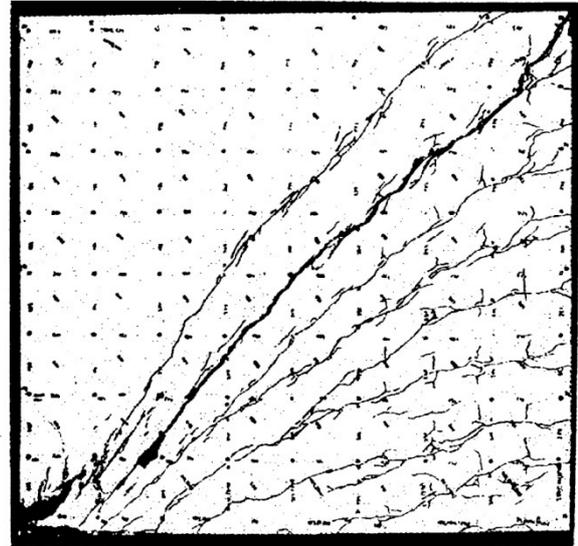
Cracking pattern for wall S9 tested by Maier and Thürlimann (1985) at diagonal tension failure
